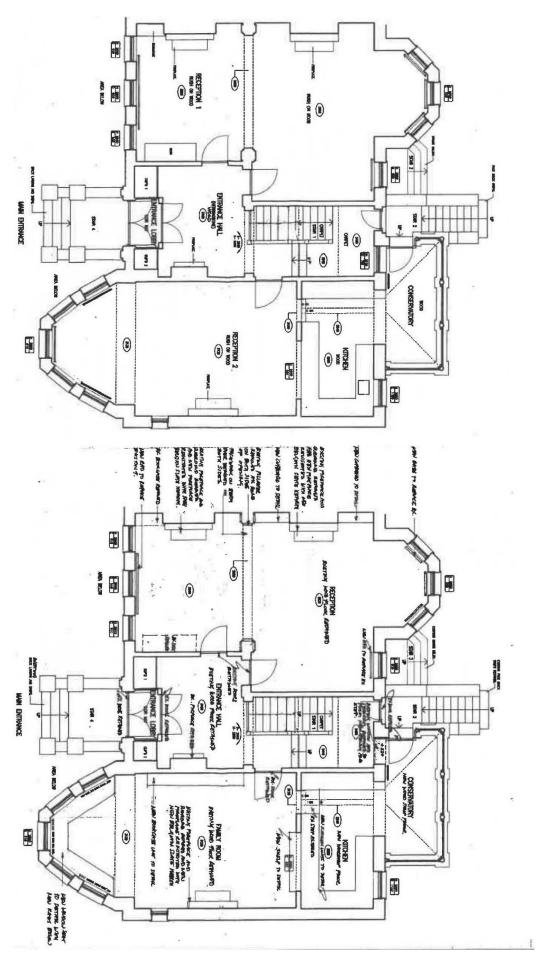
Existing (top) and proposed (bottom) ground floor plans, 2003.
